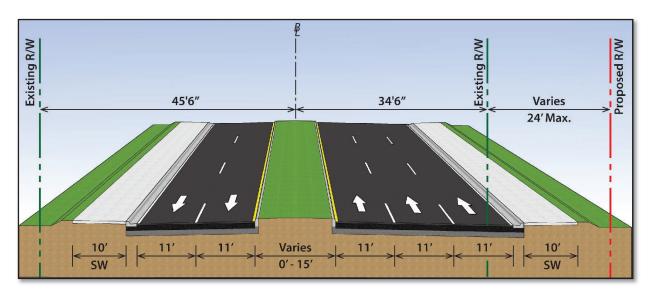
Proposed Typical Section – Whiting Street (North Brush Street to North Meridian Avenue)
